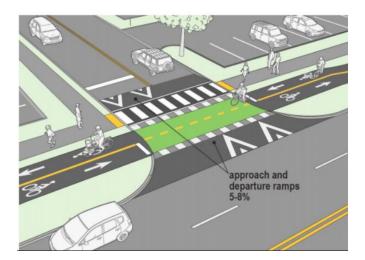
EXAMPLE OF RAISED CROSSING THROUGH MINOR STREET INTERSECTION
